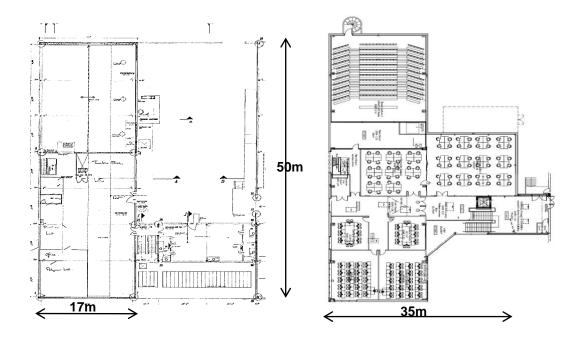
First floor plan of the foundry (1957) and the Stewart Mason building (2005)
